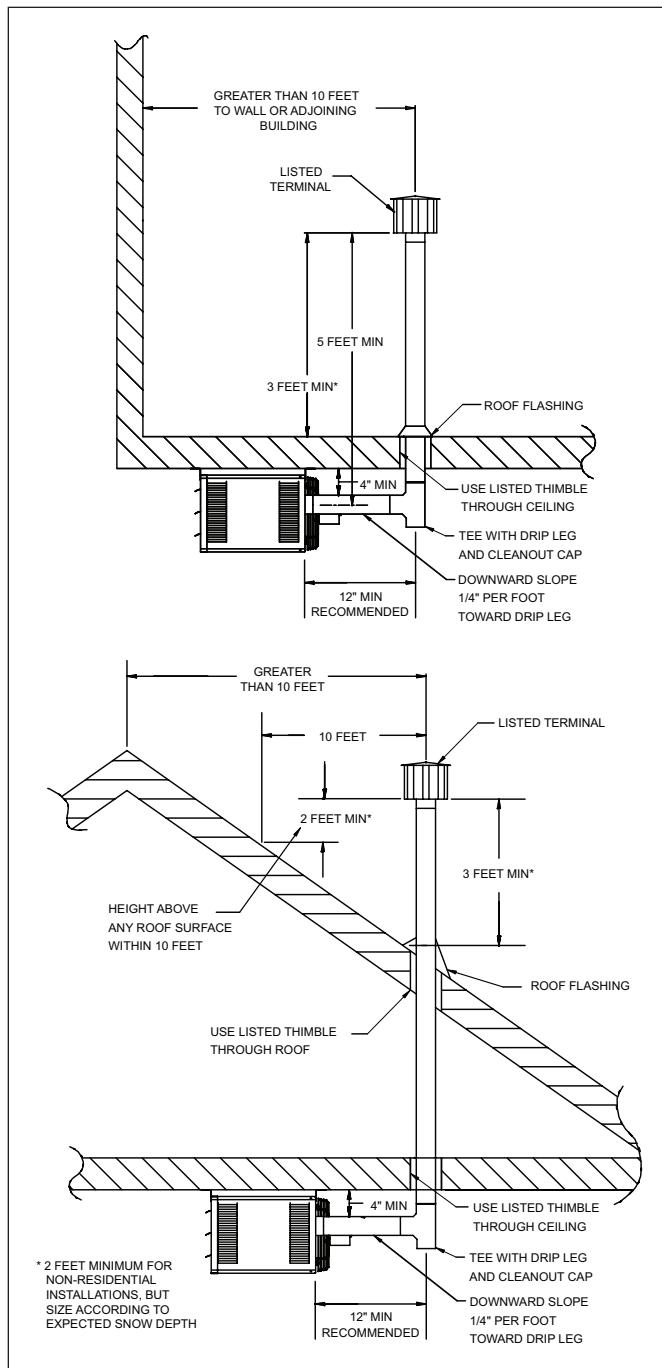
Vertical Vent Termination for Double Wall Vent Pipe and Greater Than or Less Than 8' Horizontally From a Vertical Wall or Obstruction
